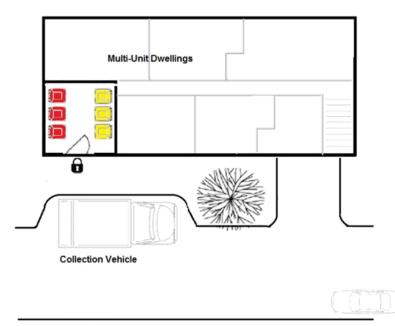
Use of off street ground floor level storage area for collection (with lay-by)
